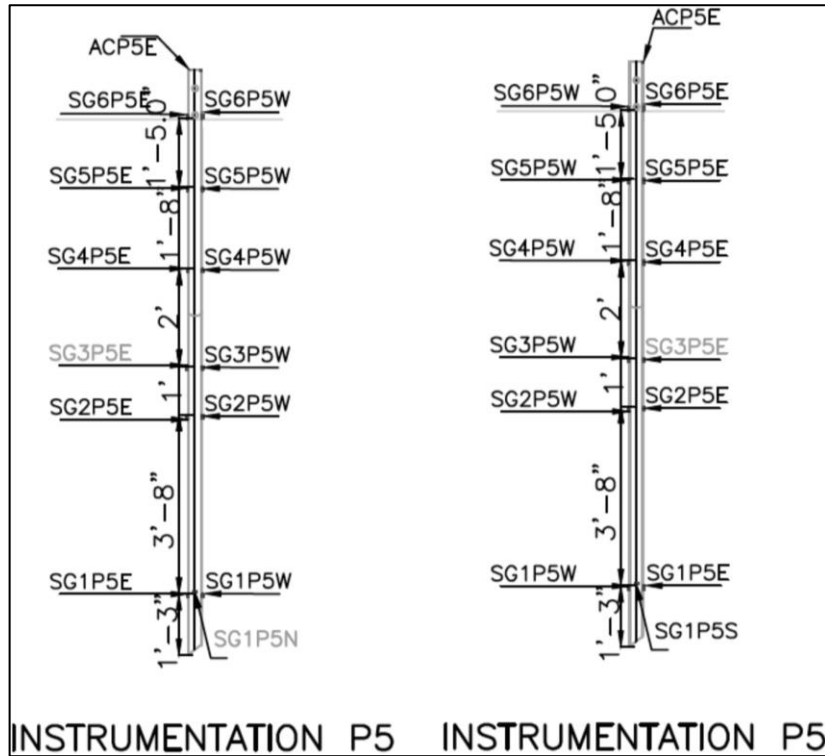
Instrumentation of all 3.5" O.D. Piles (North and South Views)
